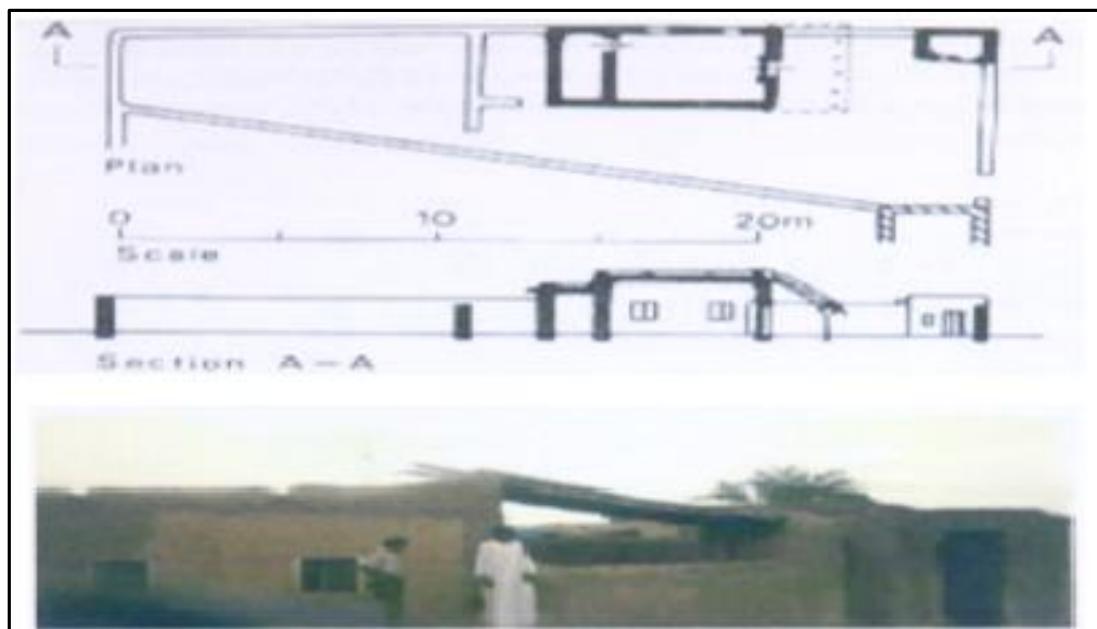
Section and view of a traditional mud house in Sudanese village (Taha, 2005)
